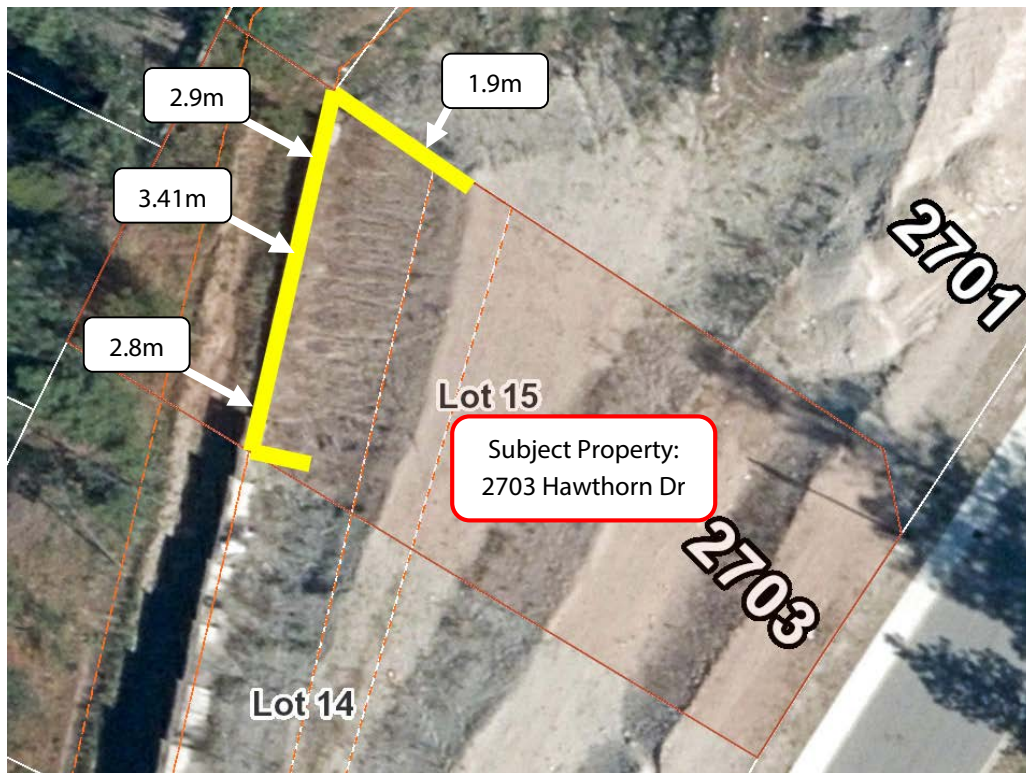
Proposed lower retaining wall (yellow) with exposed height labelled. Not pictured: the second retaining wall proposed to the east of this lower wall, which will meet Zoning Bylaw regulations.
